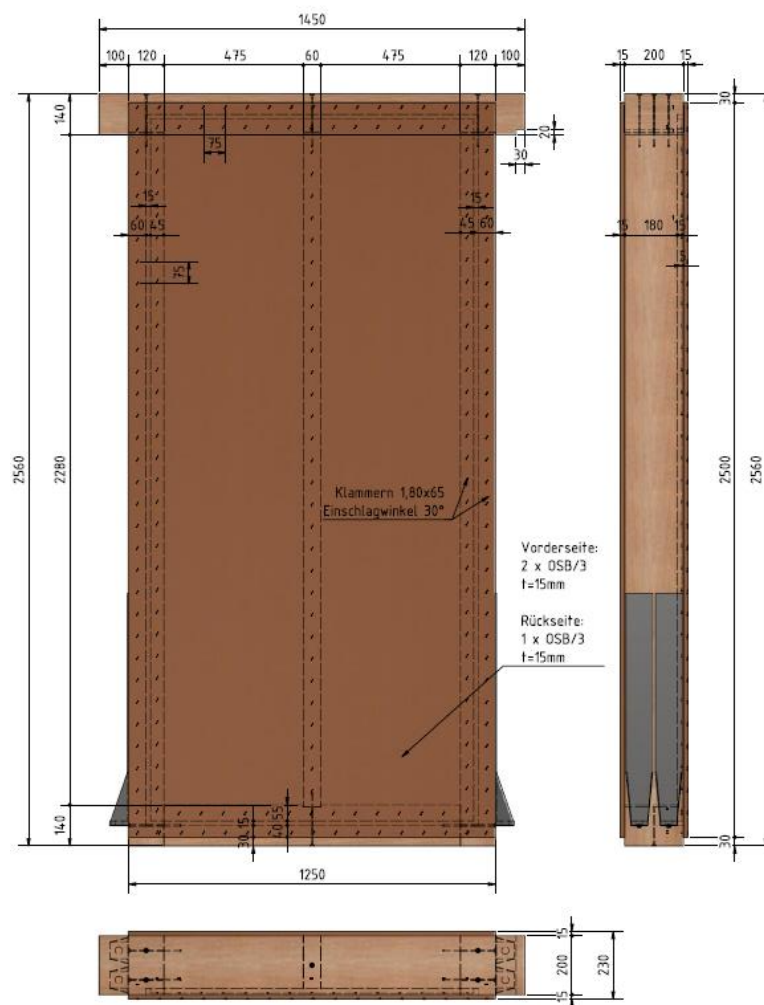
Light frame timber frame shear wall module, with the corresponding dimensions [75]
